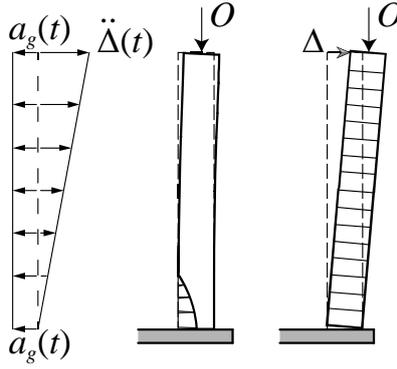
URM cantilever or parapet walls, from (Godio and Beyer, 2018).
